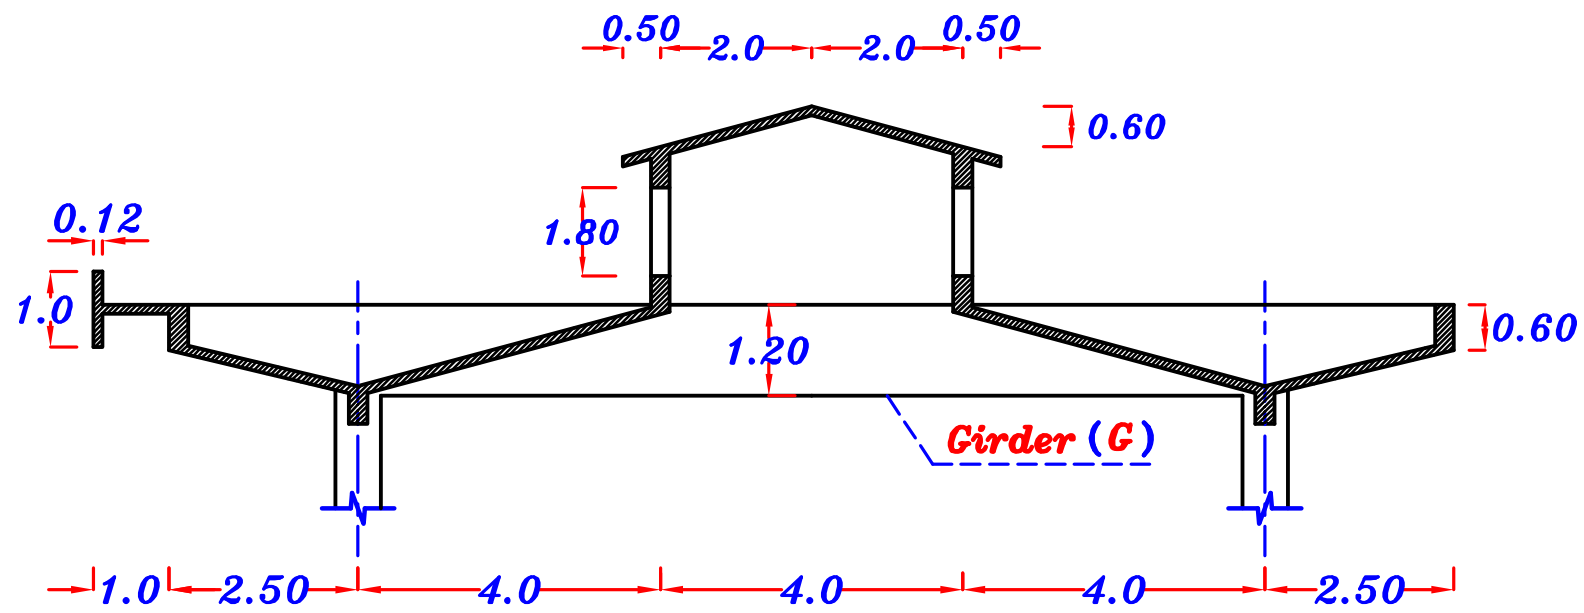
shows a sectional elevation of a reinforced concrete roof. The roof is covered by reinforced concrete slabs supported by a system of secondary beams and Girders (G), spaced at 6.0 m.
